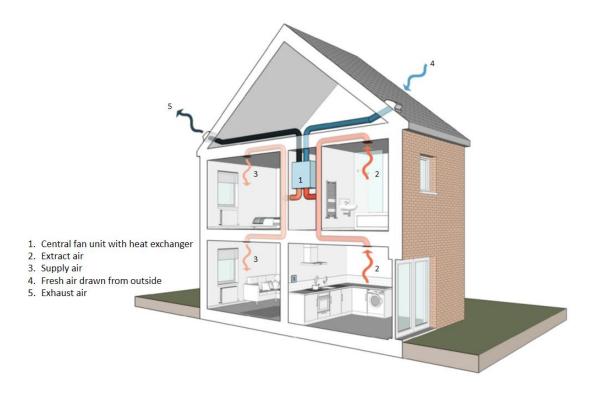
Figure III. Features of MVHR in a typical home (NHBC Foundation, 2016).
